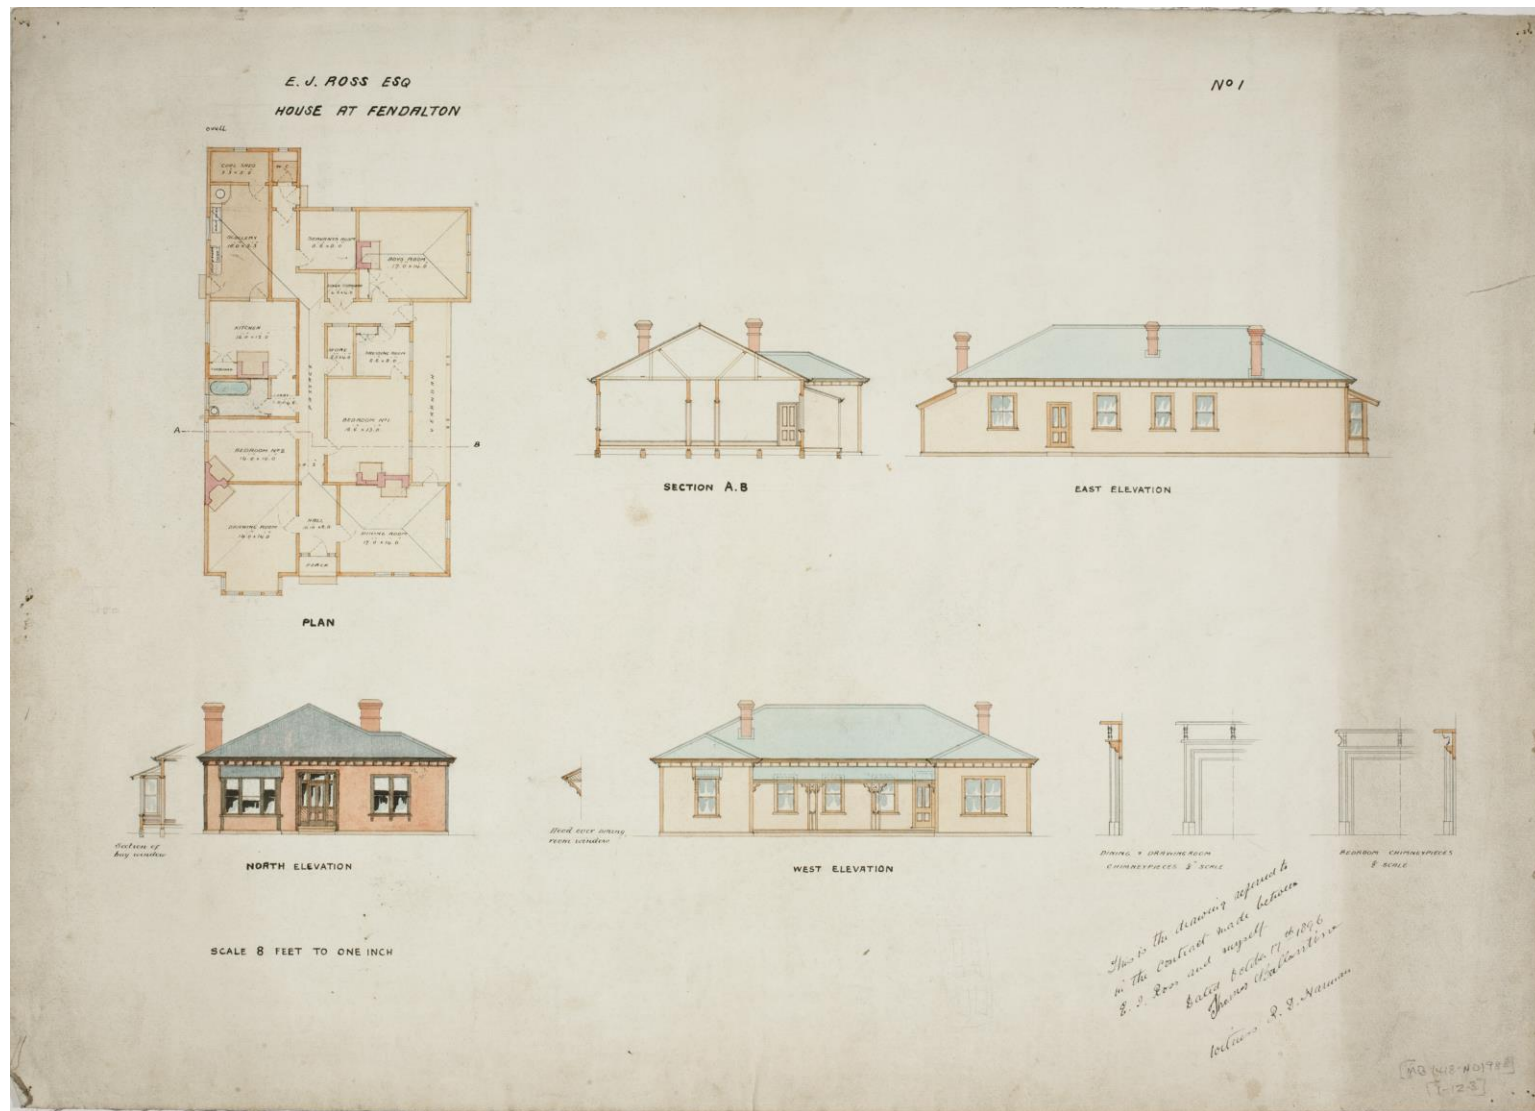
Collins and Harman, E. J. Ross, Esq., House at Fendalton, plan, elevations, section and details (1896).
